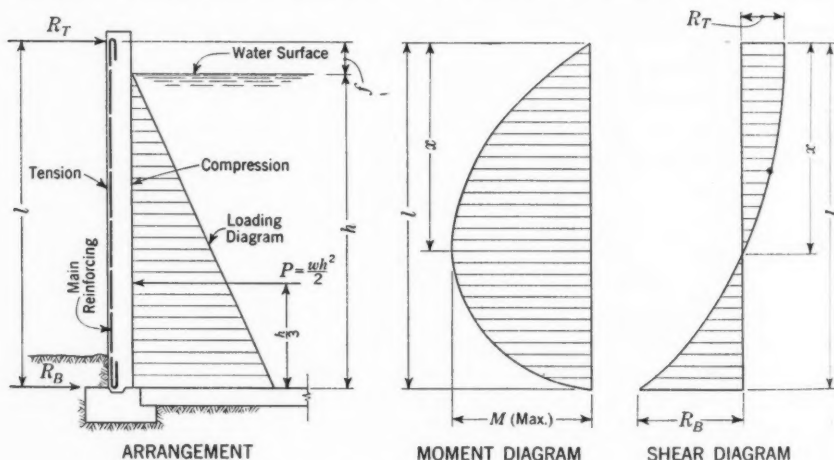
TYPICAL VERTICAL-BEAM SECTION
